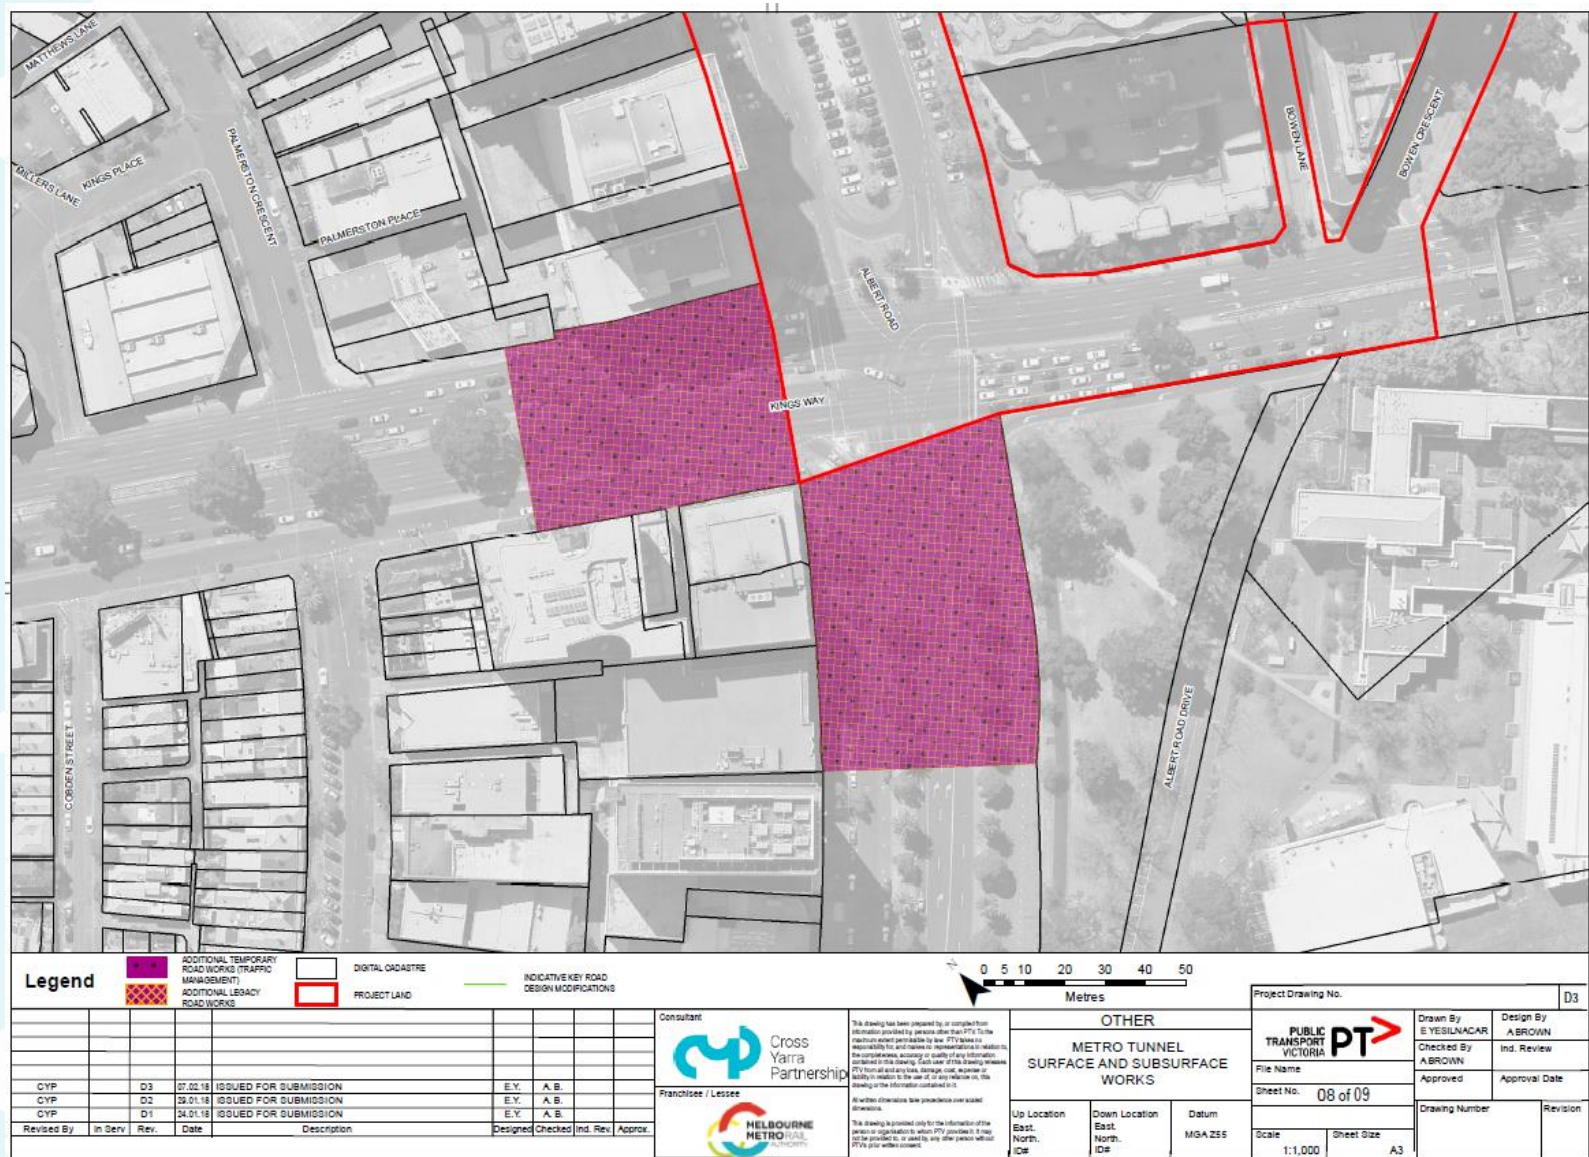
KINGS WAY AND ALBERT ROAD ADDITIONAL ROAD SURFACE WORKS
